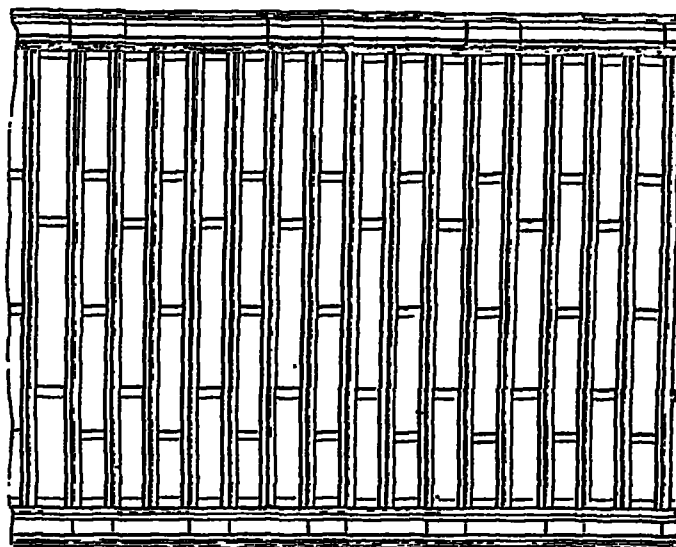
Britannia Bridge (Part Elevation of Tubular Girder).
